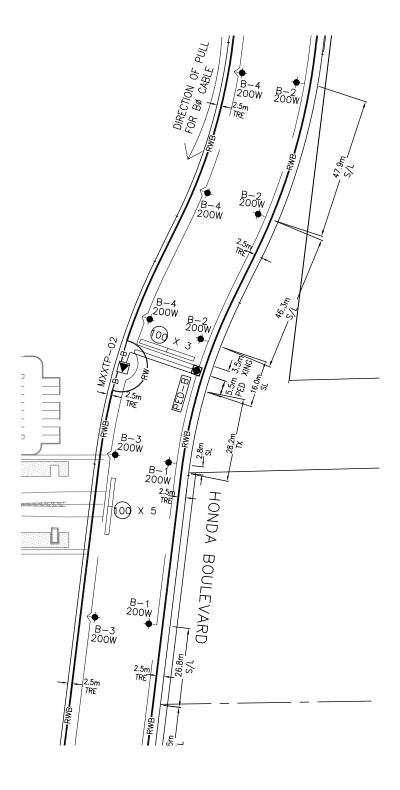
Honda Boulevard Lighting Plan, for reference only
